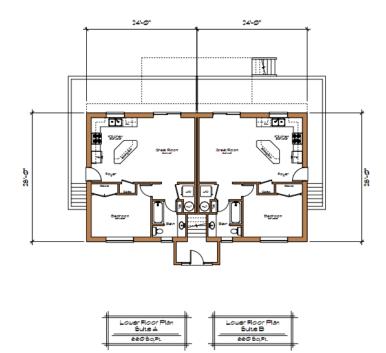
Proposed lower 1 bedroom rental units floor plan.
